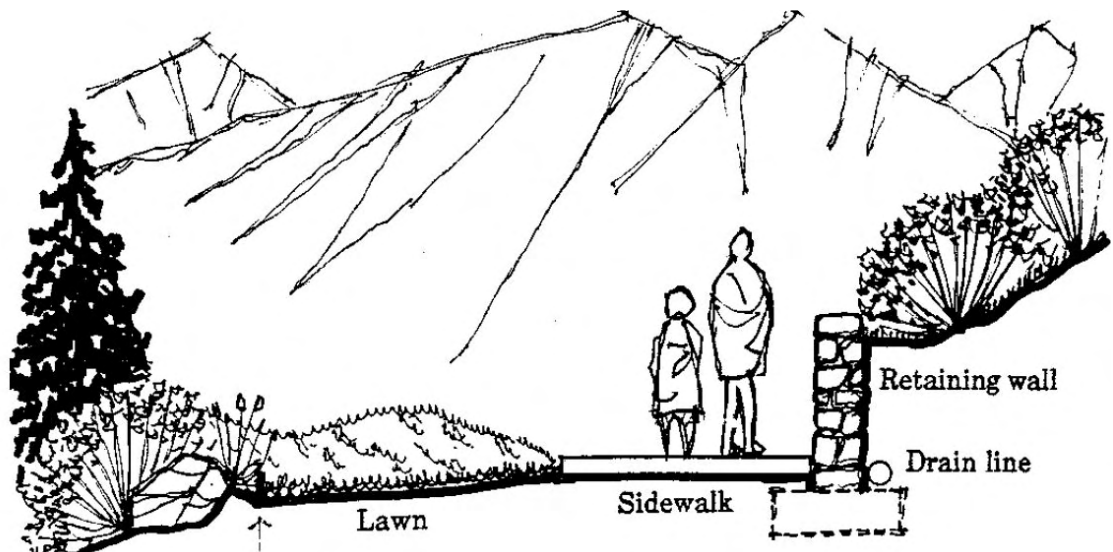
Retaining wall material shall match the surrounding landscape when possible. Image courtesy of 1997 *Winter Park Landscape Design Regulations and Guidelines*.
